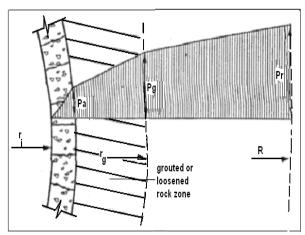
Seepage flow through cracks of concrete lining in ground mass surrounding the tunnel [4]
